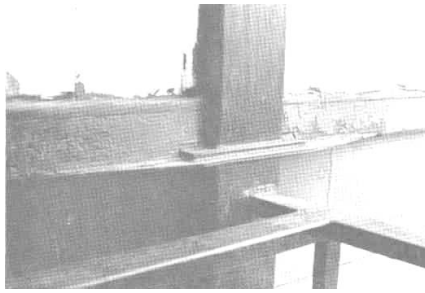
B: Critical structural details: beam-column connection. The beam stringer is welded to the column at the top, so that onsite welding is done outside high risk zones.
